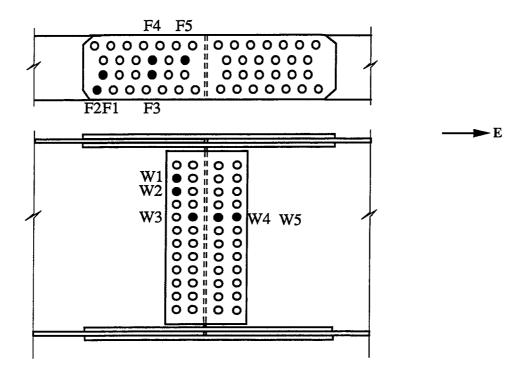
(d) Location of sampled bolts in connection E4 of bridge B3
